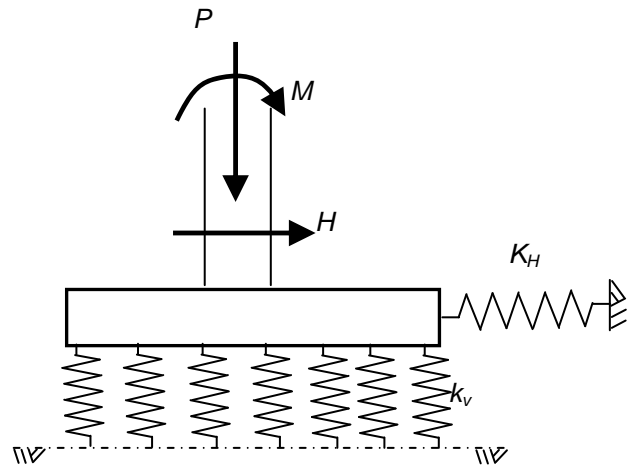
schematic of recommended FEMA 273/274 Winkler modeling approach
